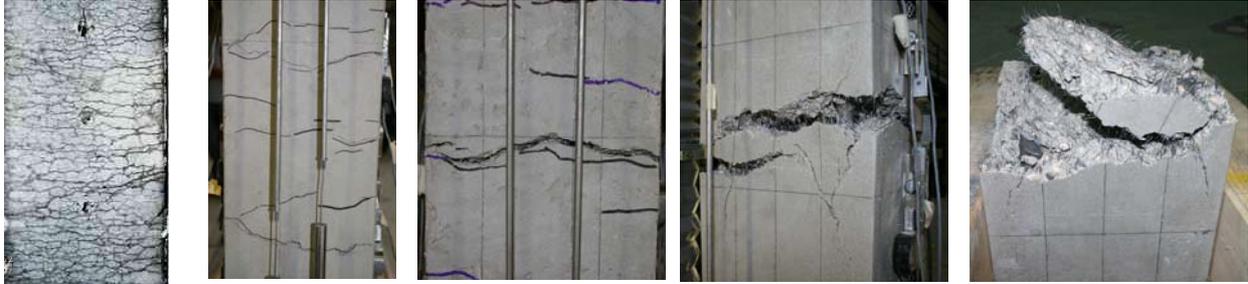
Crack pattern at different stages (from left to right): a) micro cracks formation (Jungwirth 2005), b) visible cracks, c) strain localisation, d) crack opening at the failure of the steel bars, e) final crack surface
